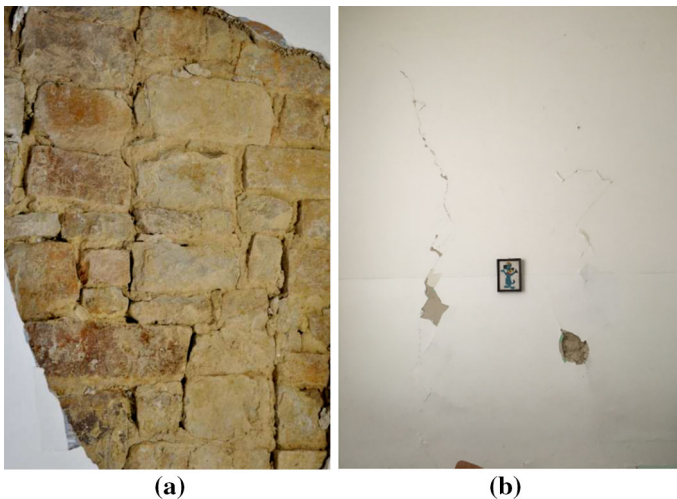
Double-leaf stone masonry with poor mortar constituting the older part of the building (a), damage on a stone URM wall: situation after the Mw6.0 event (b) (almost identical also after the Mw5.9 and 6.5 events)
